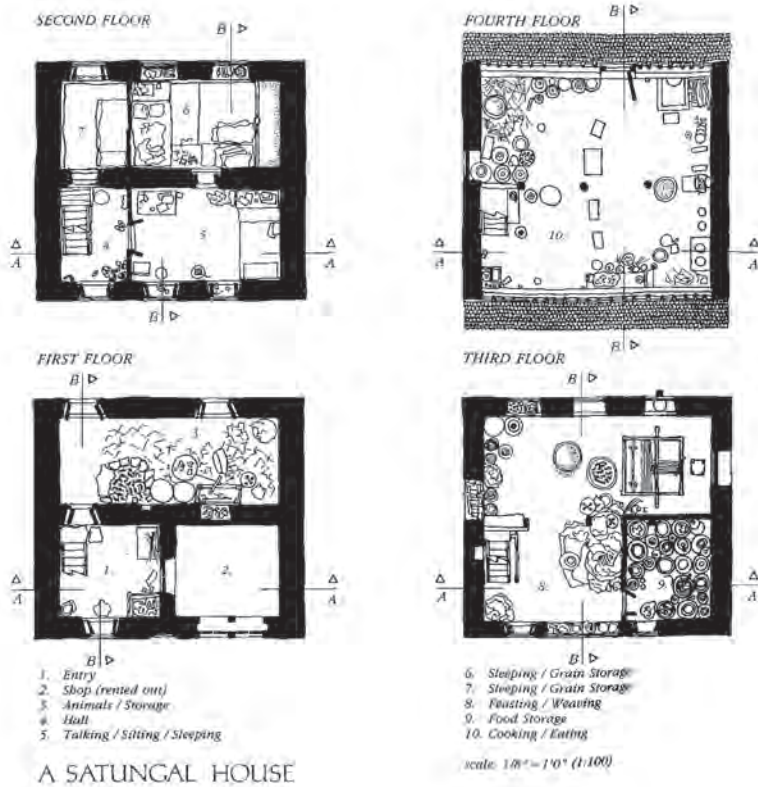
Plan of traditional newar house 'Satungal', "4 VILLAGES: ARCHITECTURE IN NEPAL"
